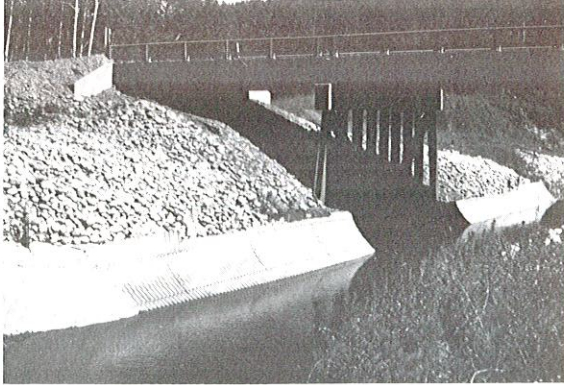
CULVERT VS. BRIDGE. This bridge replaced a culvert which frequently failed to handle peak water flows and heavy loads. Portions of the culvert were retained to prevent scour on the pier.
